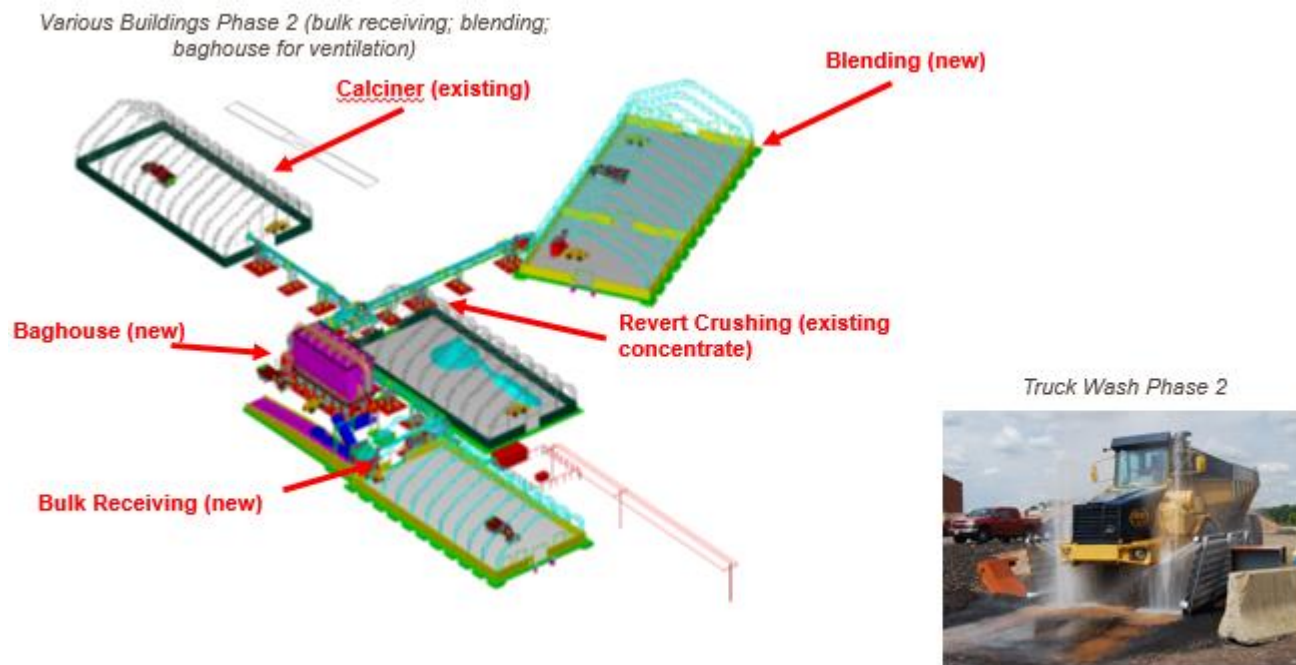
New Revert Crushing Building with Baghouse and truck wash
